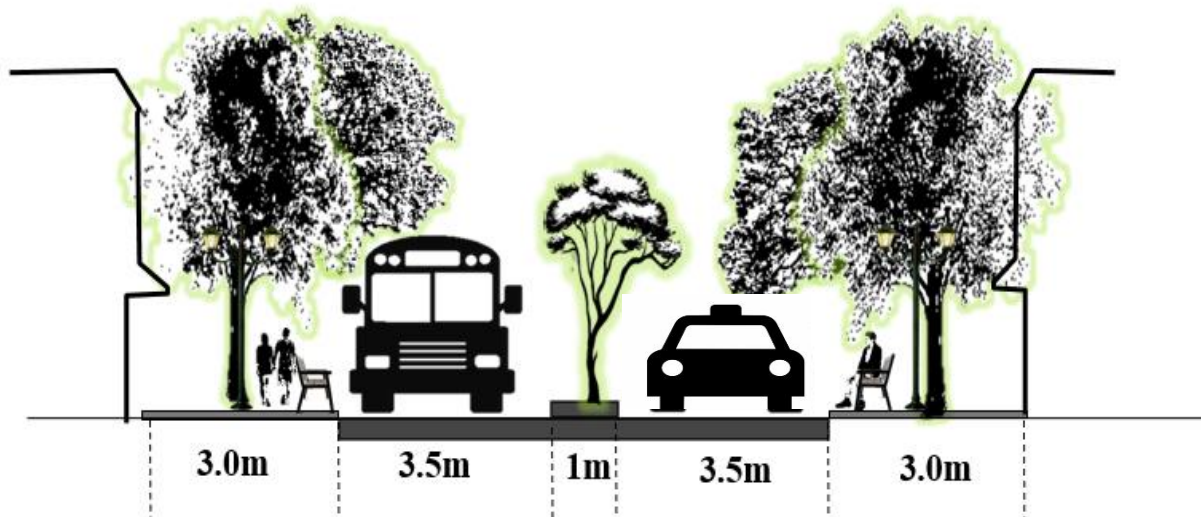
Proposed cross-section for 2nd Class “A” grade roads
